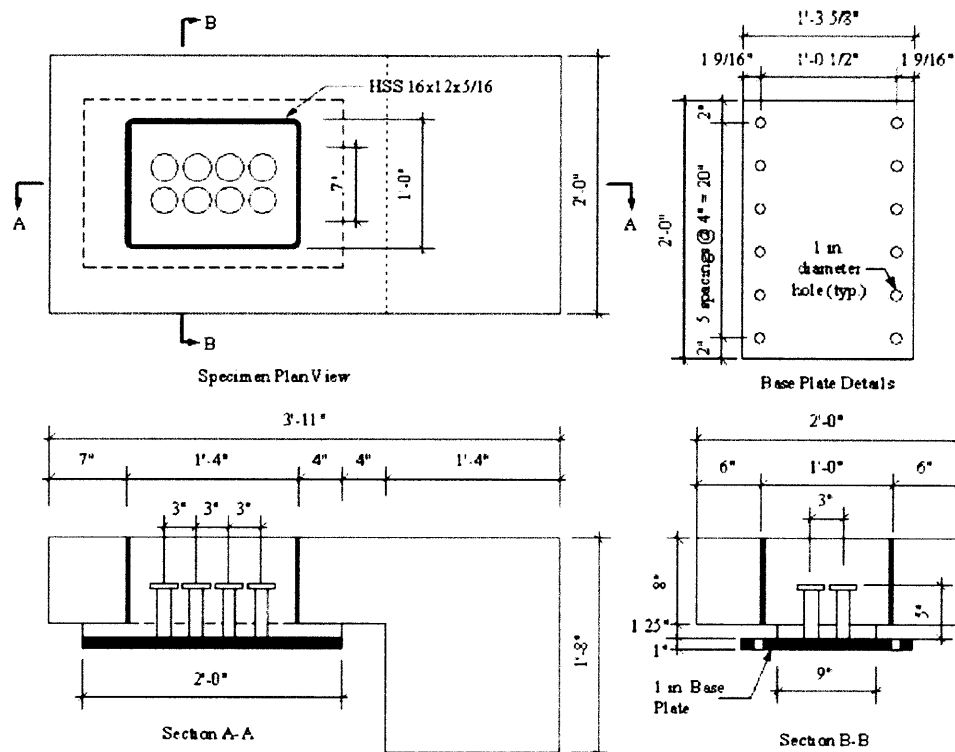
Concrete dimensions of the eight-stud, steel-tube confinement specimen
